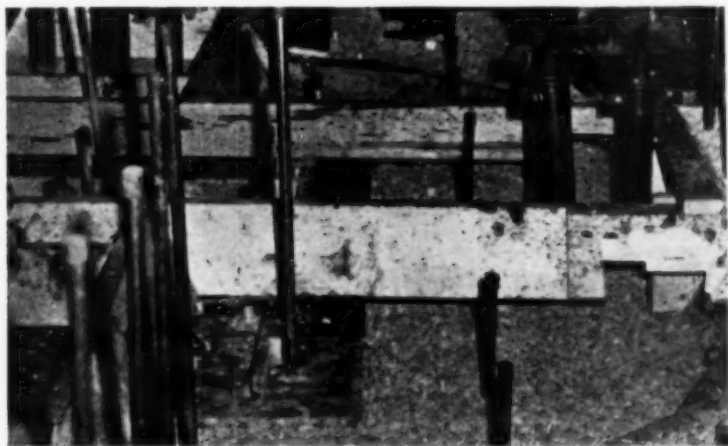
Prestressing Cables in Lower Inertia Block. Note Tops of Grouting Tubes.
